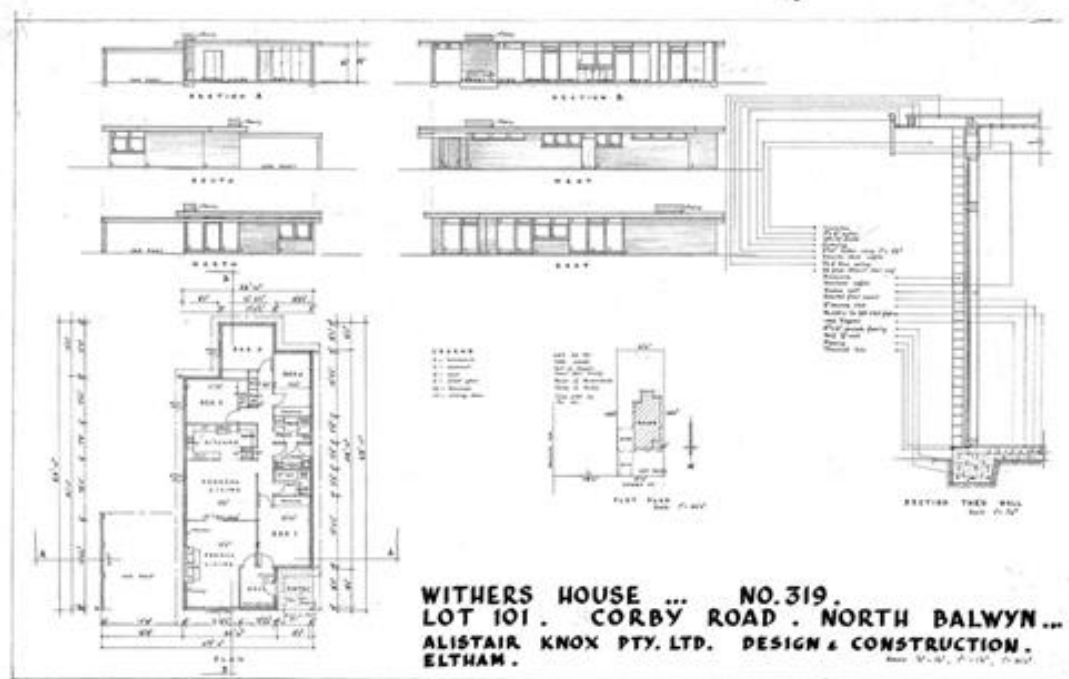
Original working drawing sheet for the Withers House, Corby Road, North Balwyn. (Source: A Knox, Job No 319, Alistair Knox Foundation)
